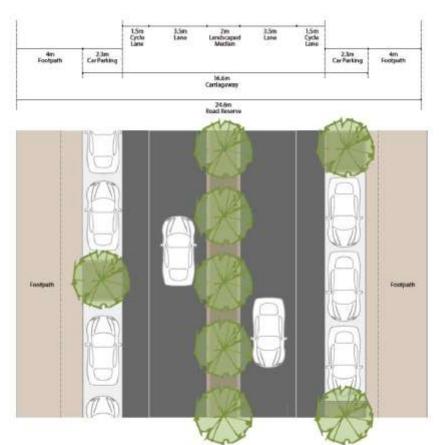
Typical Layout of the Hermitage WayCross section of the east west road treatment
